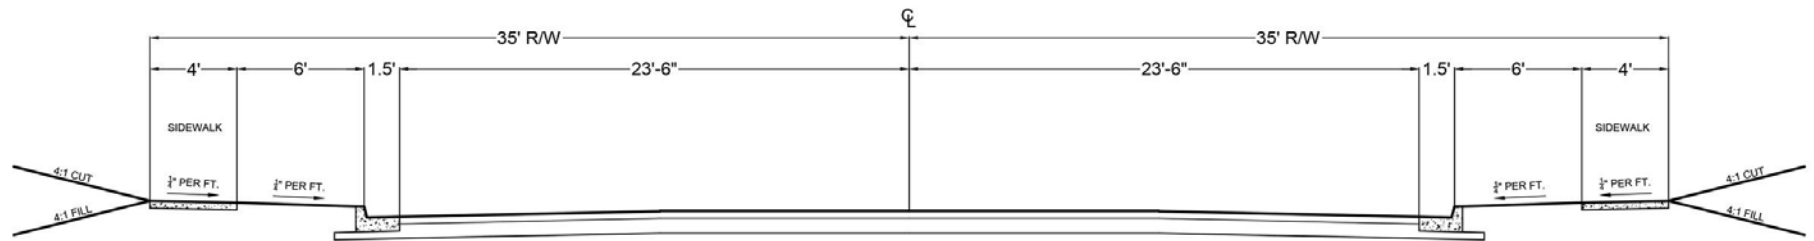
Typical Section for Non-Residential Collector, Industrial Area; Non-residential Collector, Intersection with Arterial Street for at least 250 Feet
